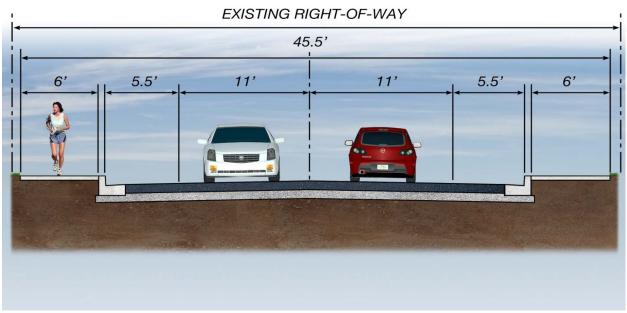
Proposed Roadway Section East of Proposed Movable Bridge
